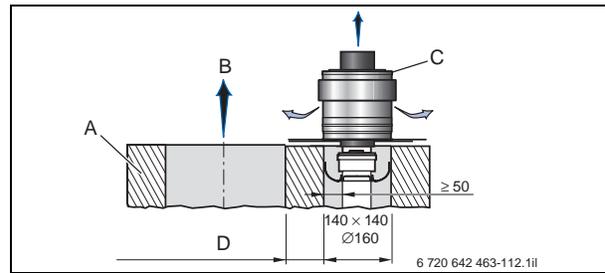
Minimum dimensions of the shaft cross-section and the shaft terminal for the flue (dim. in mm)
